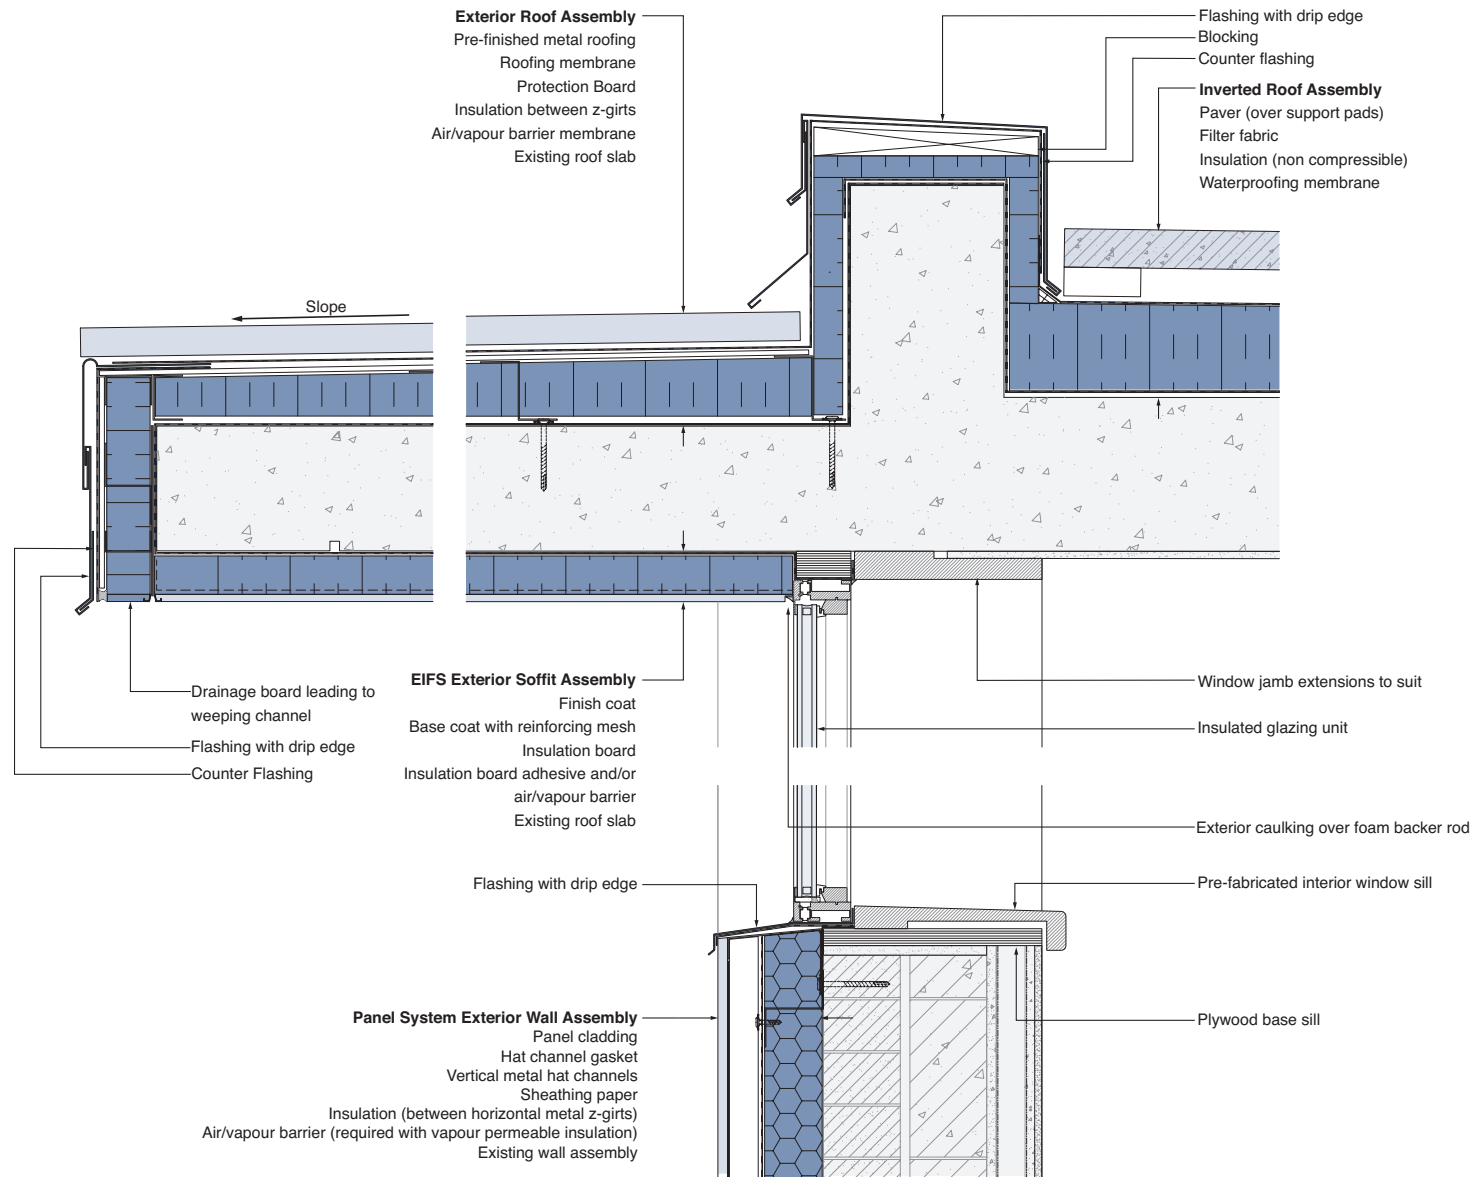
Two roofing systems are depicted in the above detail. An inverted roof system is shown for the main roof area, and a metal roofing system is shown for the cantilevered roof slab. EIFS is applied to the soffit and the balcony wall and window replacement are the same as detailed in the previous section.
